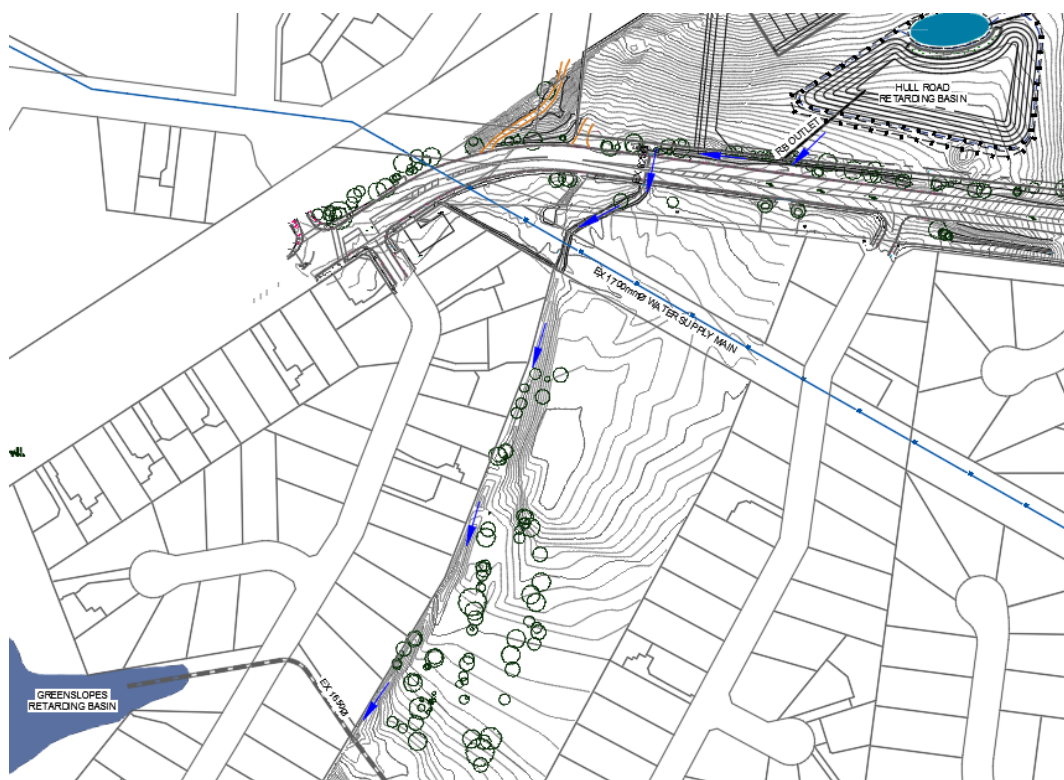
Proposed Outfall for Mooroolbark Drain Catchment
